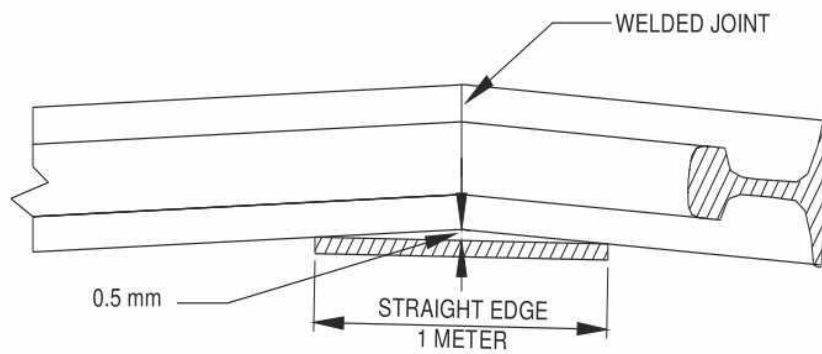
(b) Tolerance of Lateral Misalignment of Welded Joint
